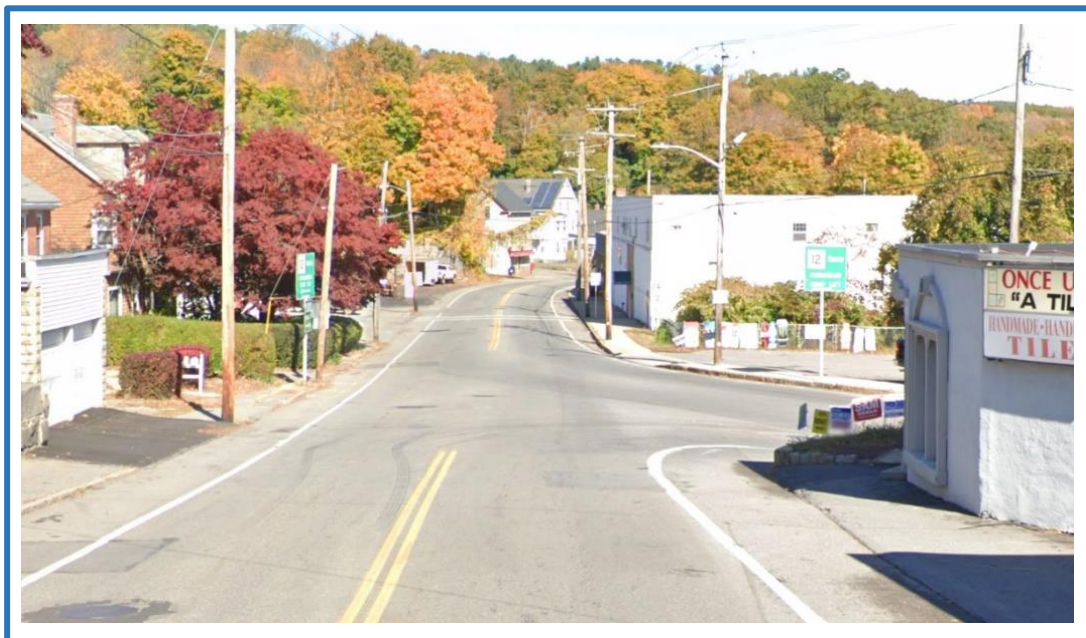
Street view of Route 12 (Ashburnham and River St.) and Route 31 (Westminster St.) in Fitchburg, Massachusetts.
